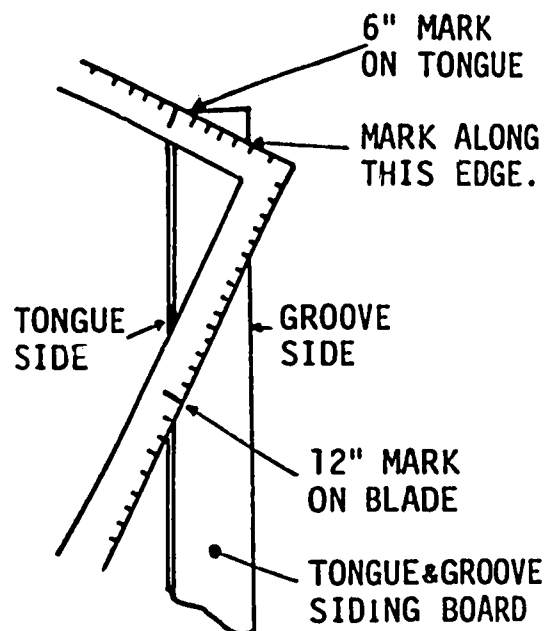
A-6. Framing Square in Place: Tongue Edge Defines Slant of Line to be Marked for Saw Cut
